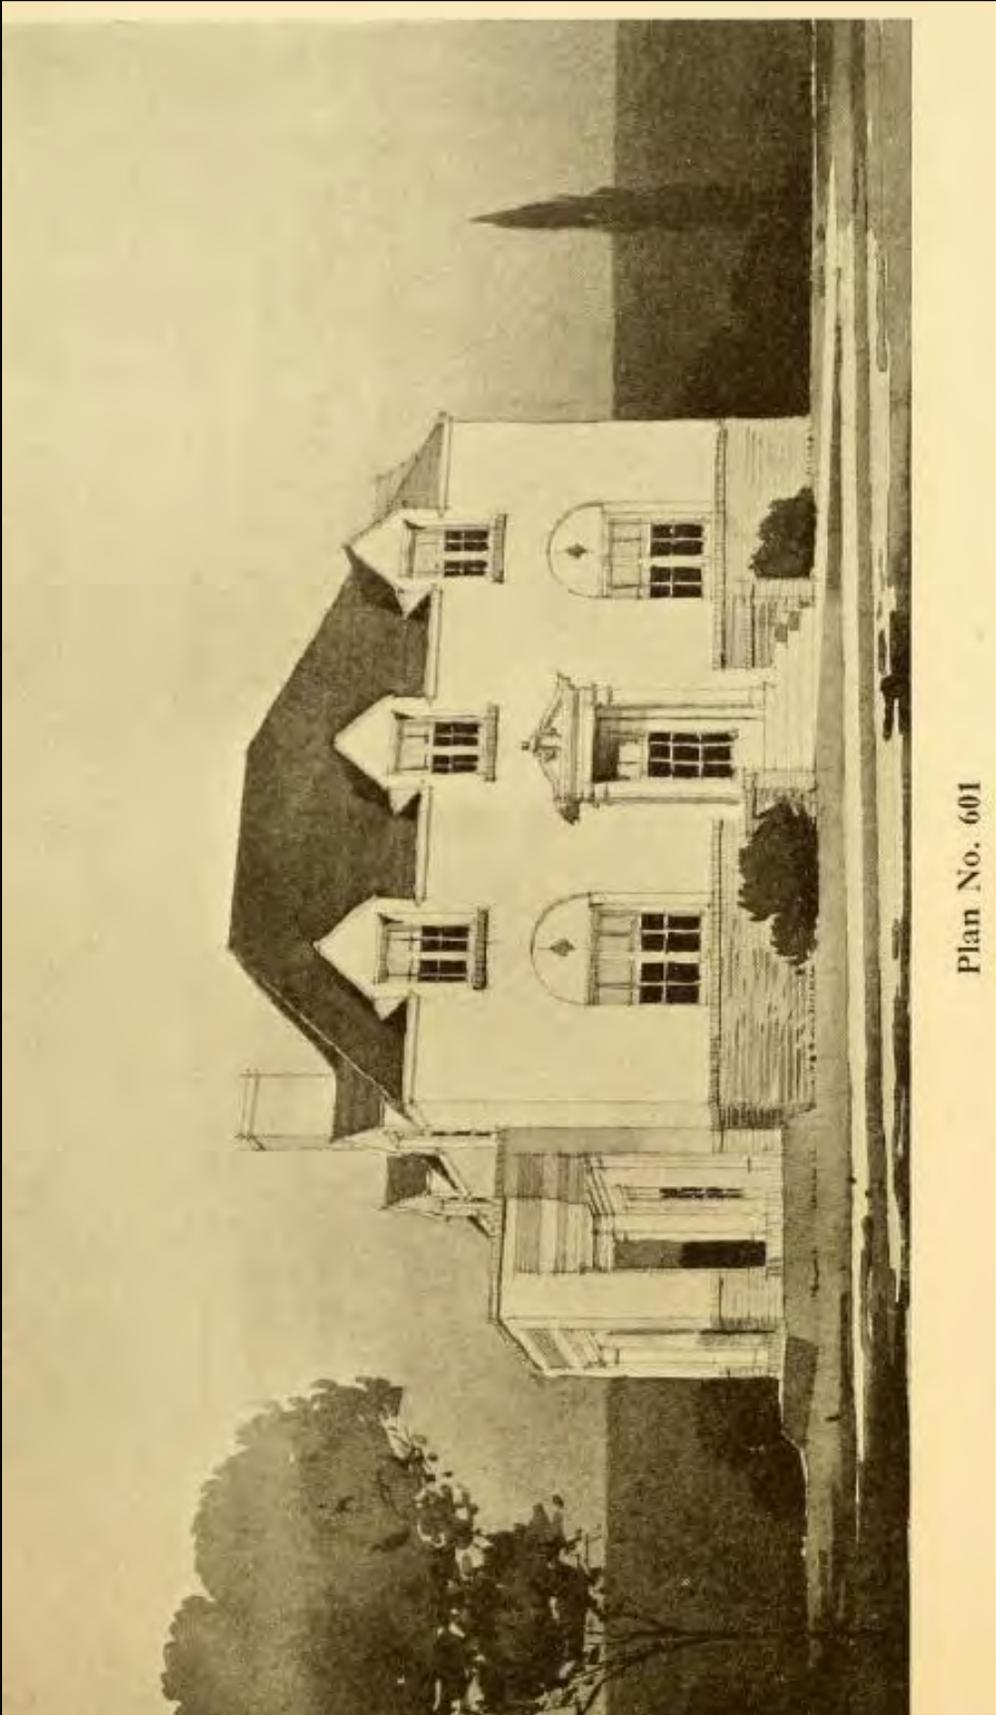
Elevation No. 601 (Source: Architects' Small House Service Bureau 1922).
